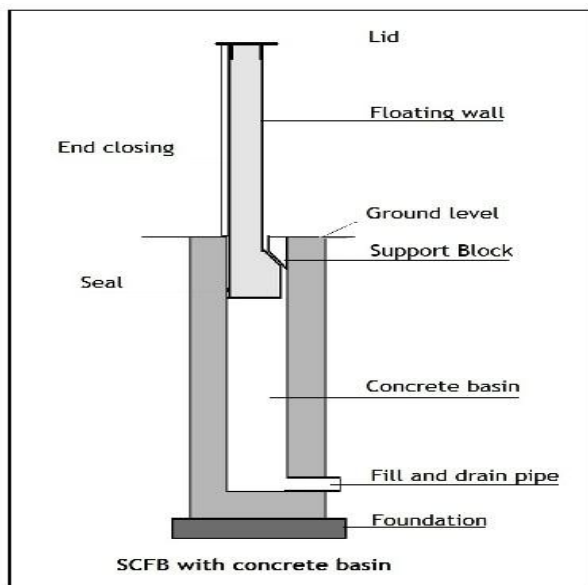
Section view of the barrier with service pit (or) concrete basin.
